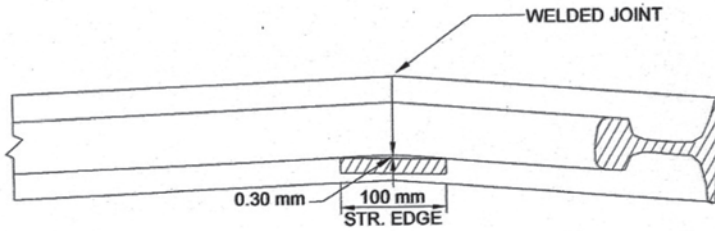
(h) Tolerance for Finishing on Sides of Head of Welded Joint with New Rails
